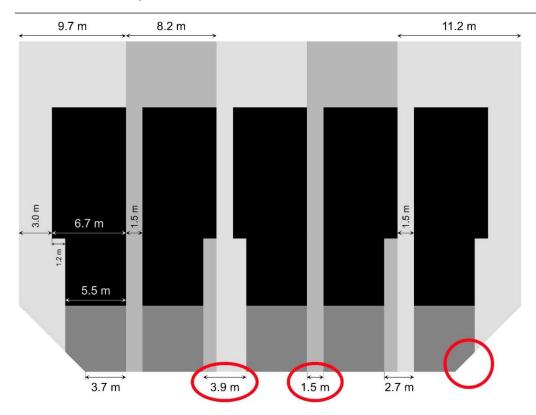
20 ft Building Pocket Zero Lot-Line Block Face
